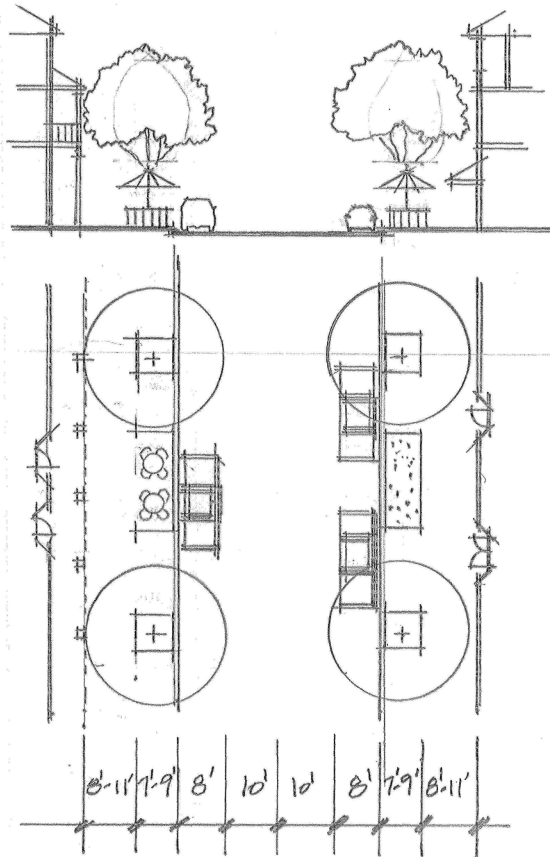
Mixed-Use Street: The curb-to-curb dimension should be the minimum necessary for parallel parking on both sides and fire access (typically 20 feet clear). Sidewalks should be 14 to 20 feet wide overall, leaving generous space for planting, cafes and street furniture.(Draft)
